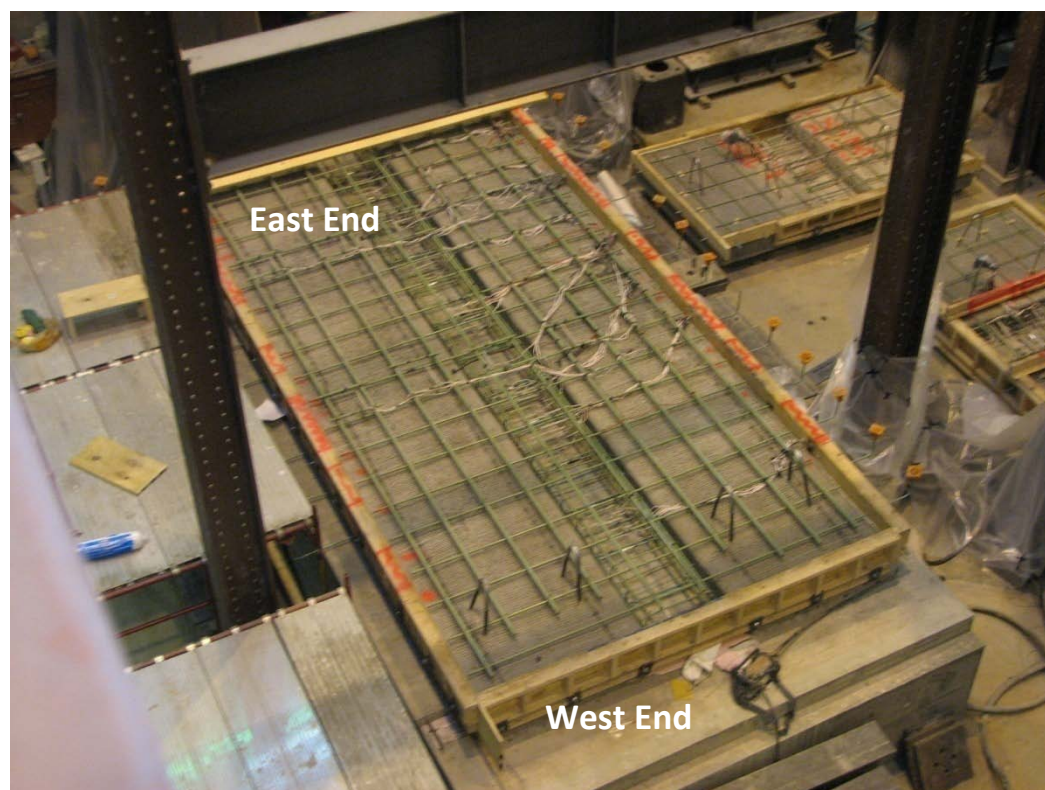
Photograph of the Concept 2 laboratory bridge specimen prior to placement of CIP concrete
